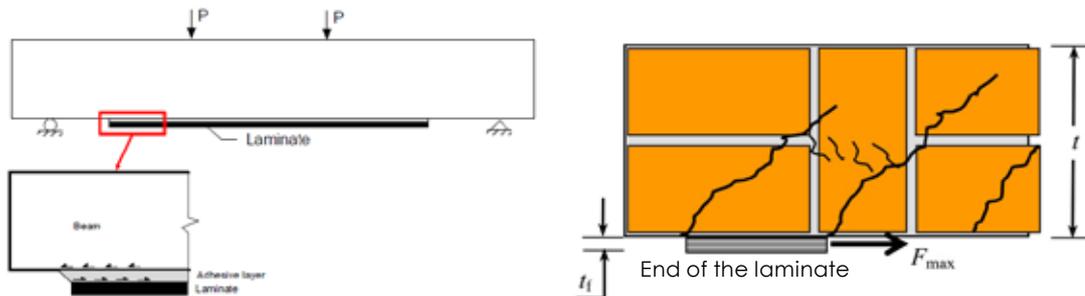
Debonding modes of composite reinforcement from concrete substrate
